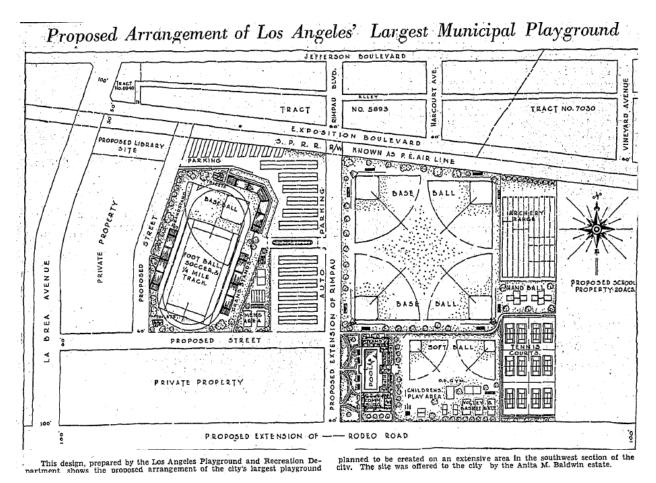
Plan for new playground, 1936 (LAT 1936b)
